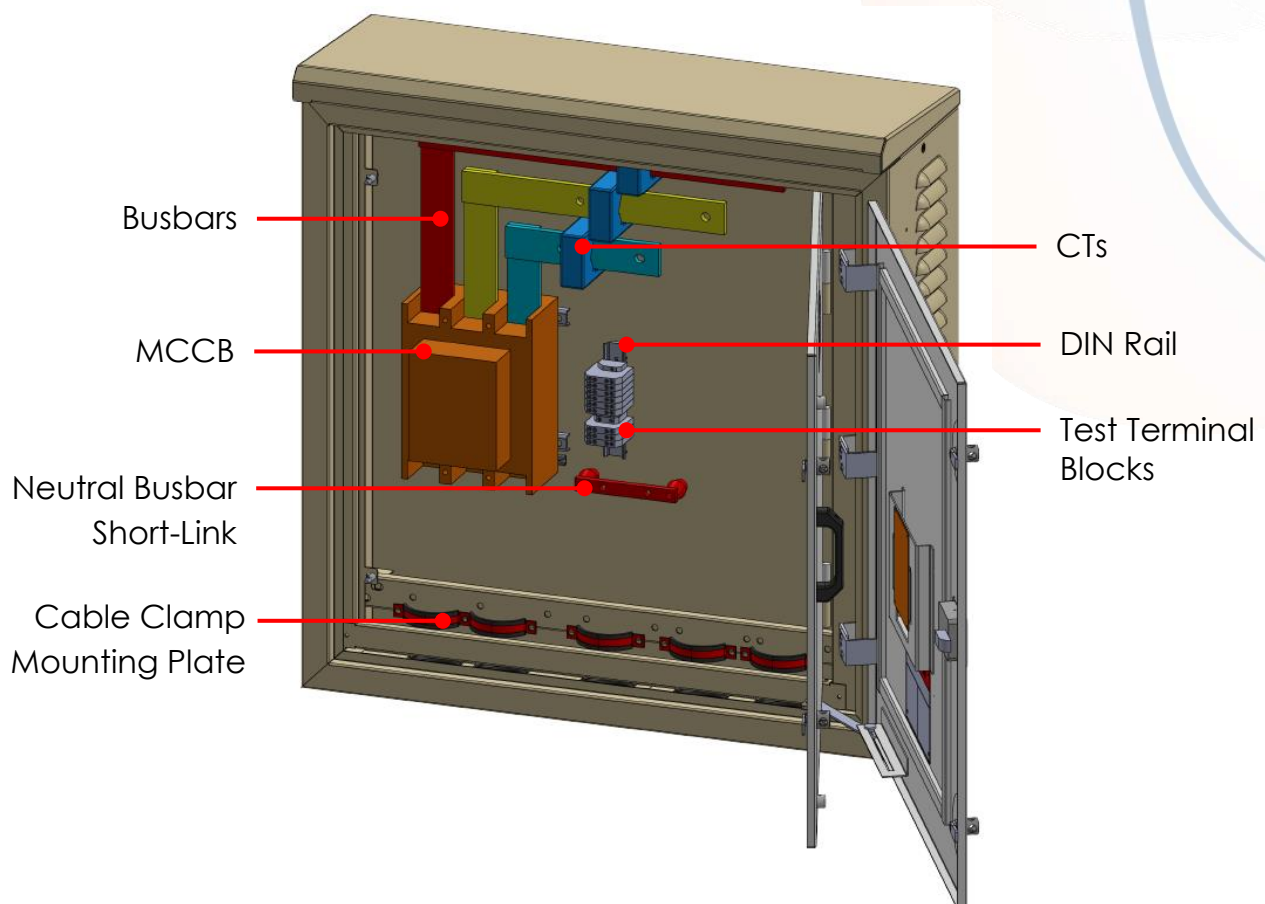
Perspective Drawing of the Service Cabinet with Enclosure Main Door Opened
